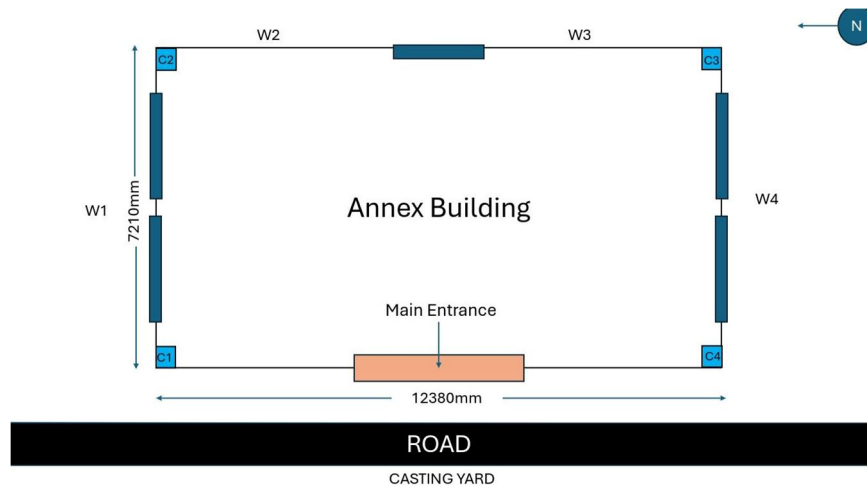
The diagrammatic layout of the building. The figure above is provided to clarify the nomenclature of the elements, which will be referenced in subsequent sections. All dimensions are in mm.
